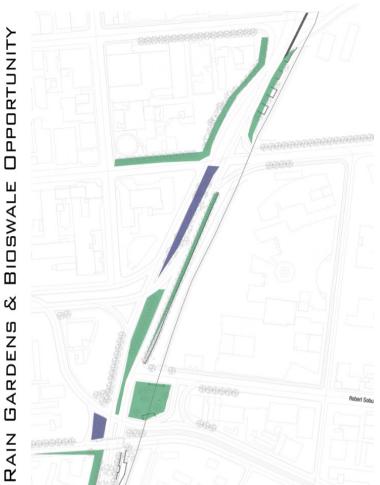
Sketchplan Area 1:500\_Stormwater Lines & Inlets, Rain Gardens & Bioswale Opportunity (Author 2014)
